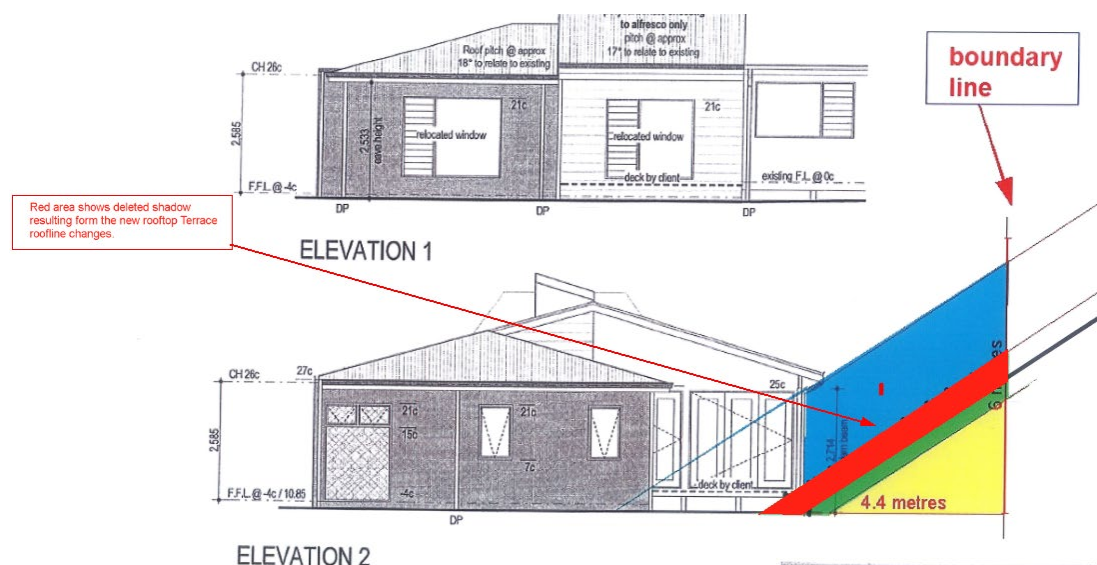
Diagram illustrating shadow impact of proposed development upon adjoining southern dwelling (No. 10 Hickory – east elevation shown above). The area shaded red demonstrates the reduction in extent of overshadowing due to changed roof pitch and form.
